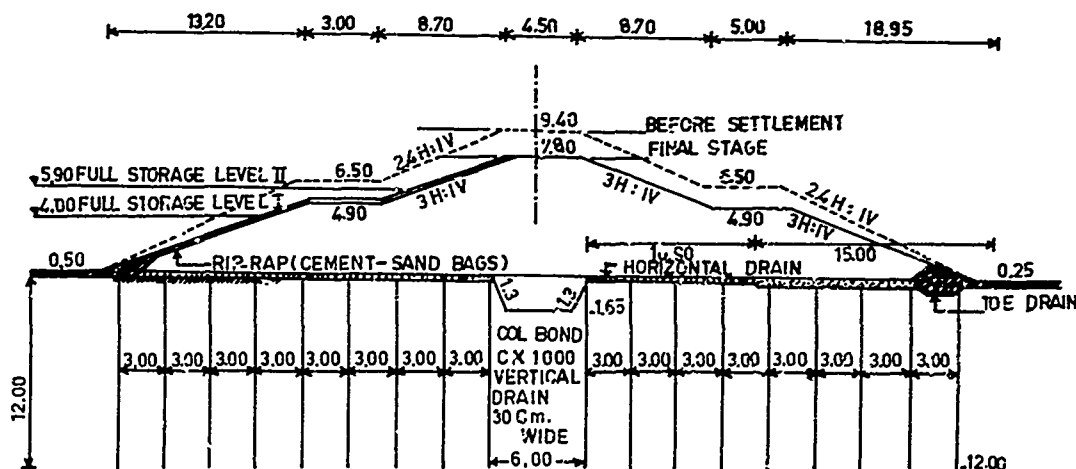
TYPICAL CROSS SECTION OF MANGGAR BESAR DAM
